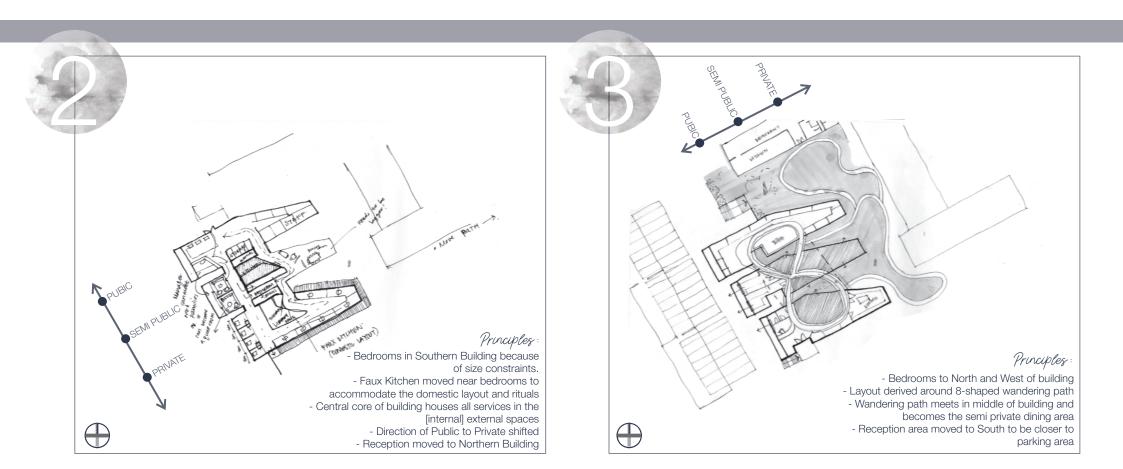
Existing Plan (Author 2018) Figure 8.7: New Construction Plan (Author 2018) Figure 8.8: Public to Private orginisation (Author 2018) Figure 8.9: Path development- circular vs square (Author 2018) Figure 8.10: Plan development iterations (Author 2018)
